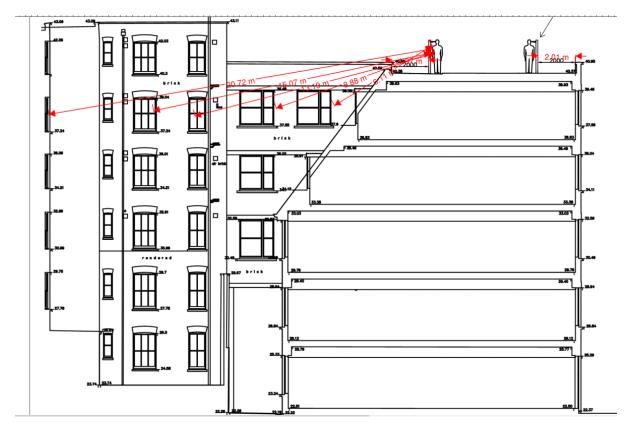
(above): Proposed terrace and distance from windows in the rear of Russell Chambers residential block
